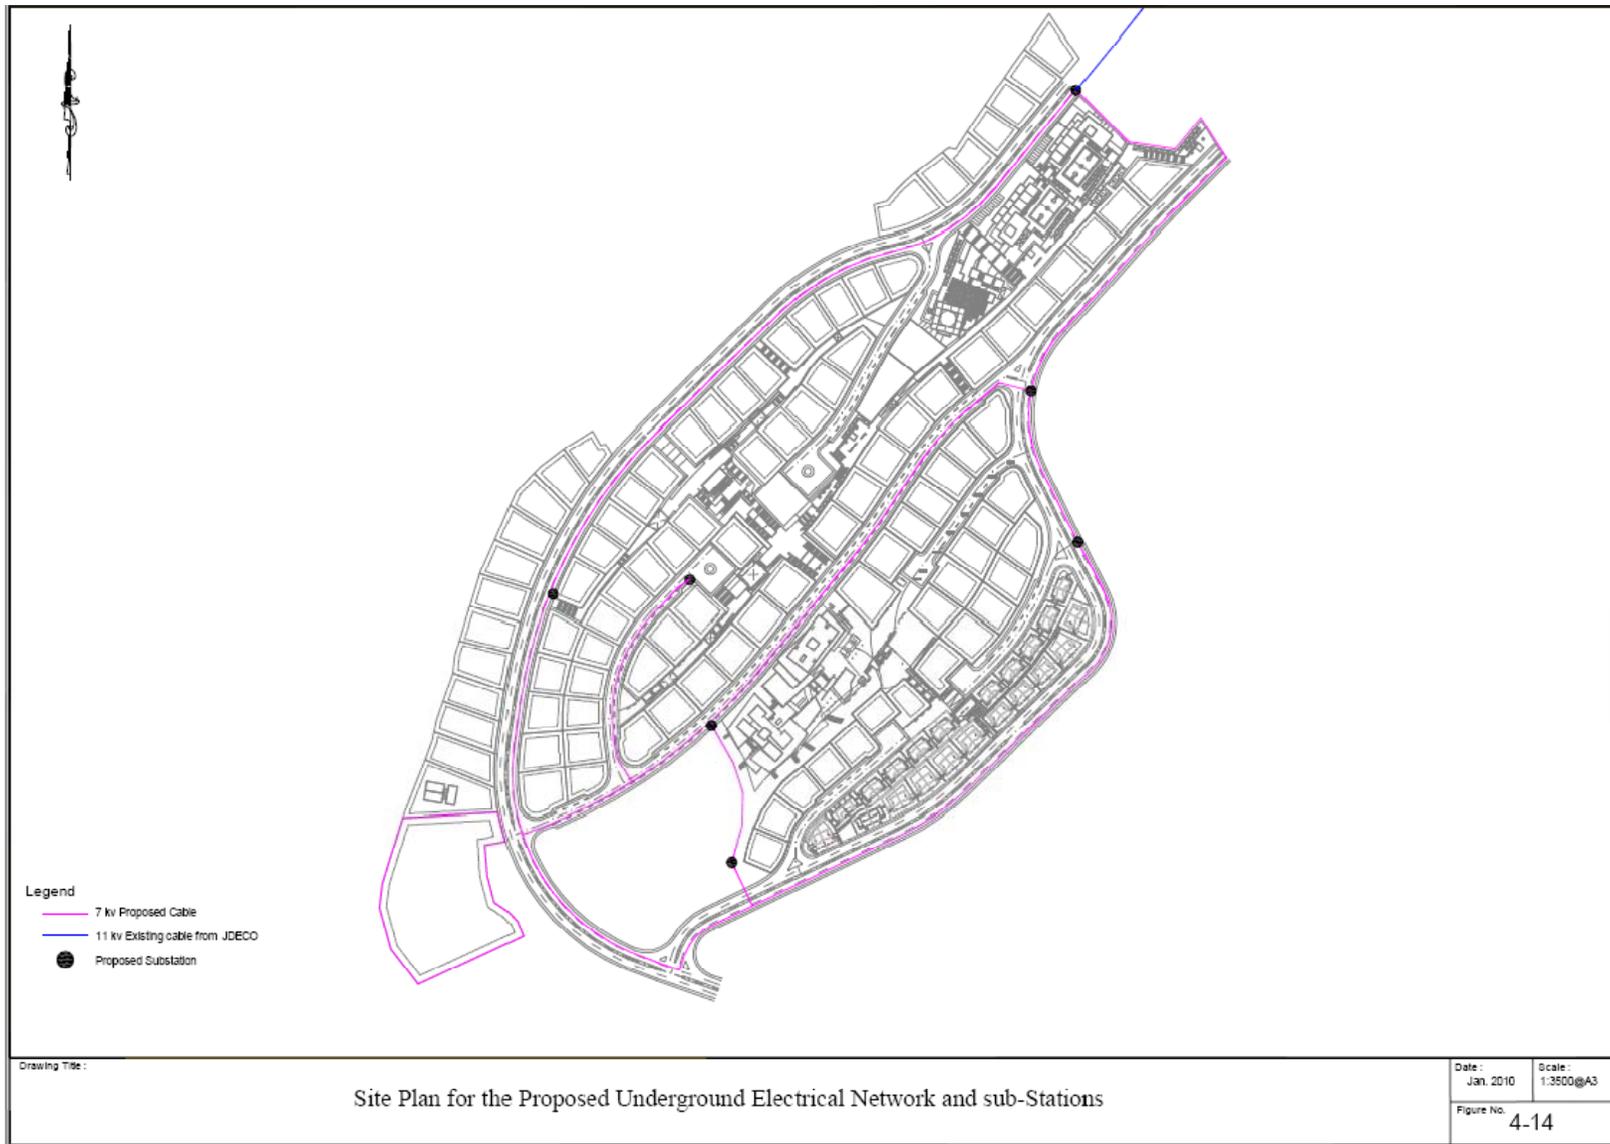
Site Plan for the Proposed Underground Electrical Network and Sub-Stations
